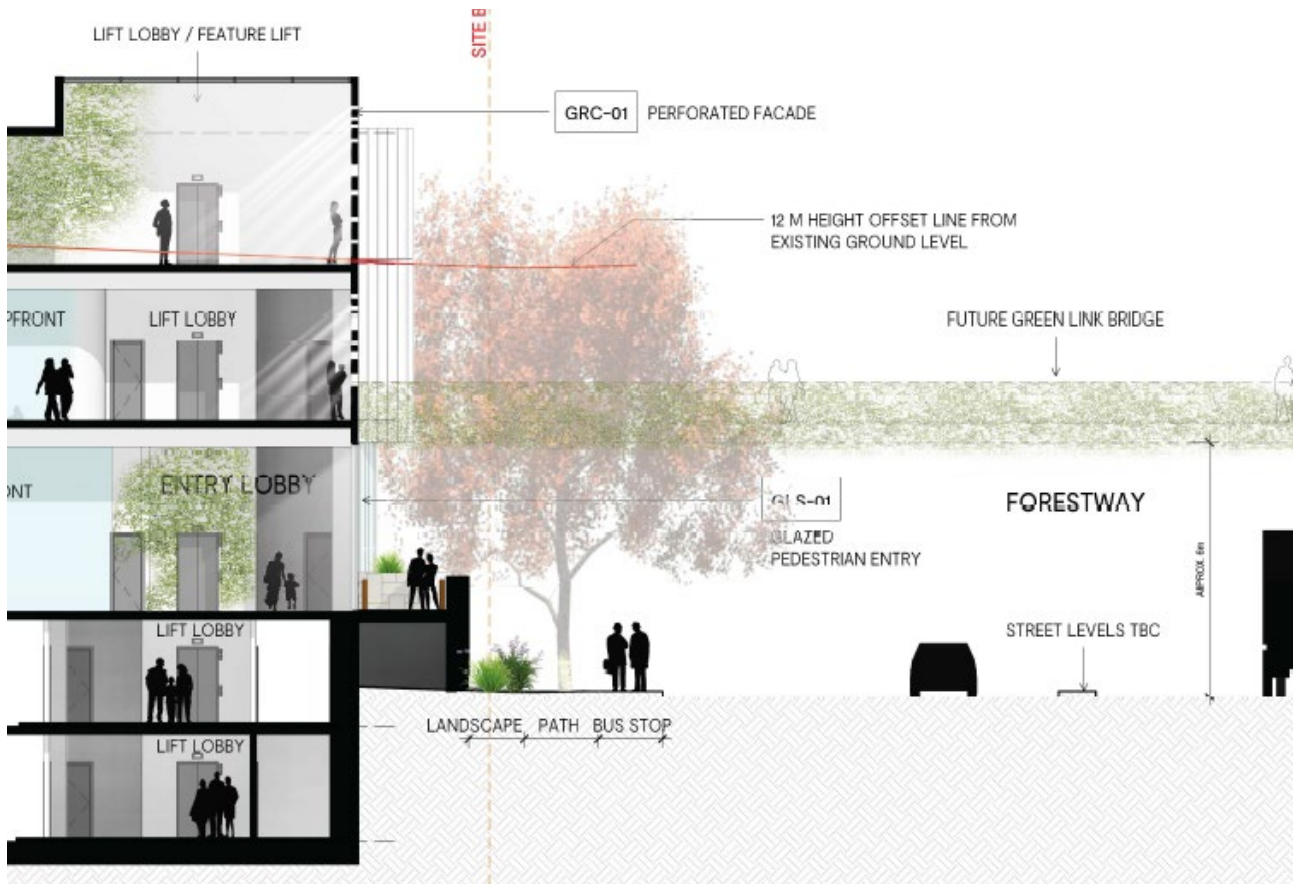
Level 1 Section showing potential connection to future pedestrian bridge (at lift lobby)
